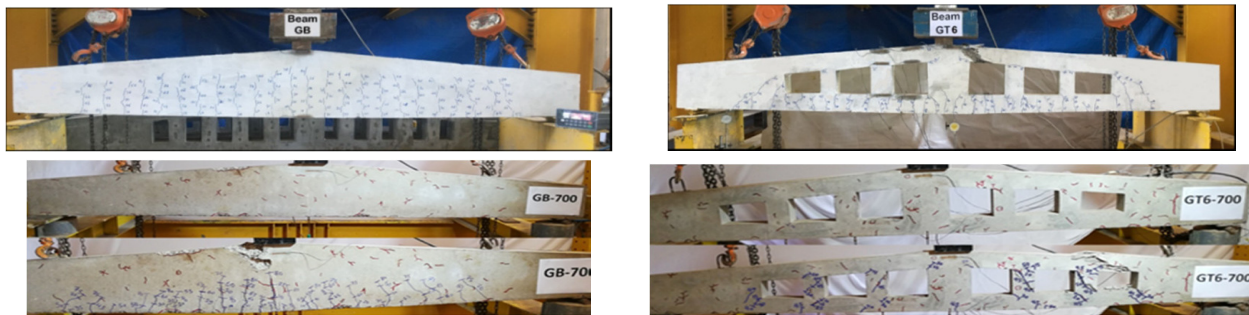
The pattern of cracking and the appearance of the first crack in the reinforced concrete gable beams with multiple openings and exposed to fire.
